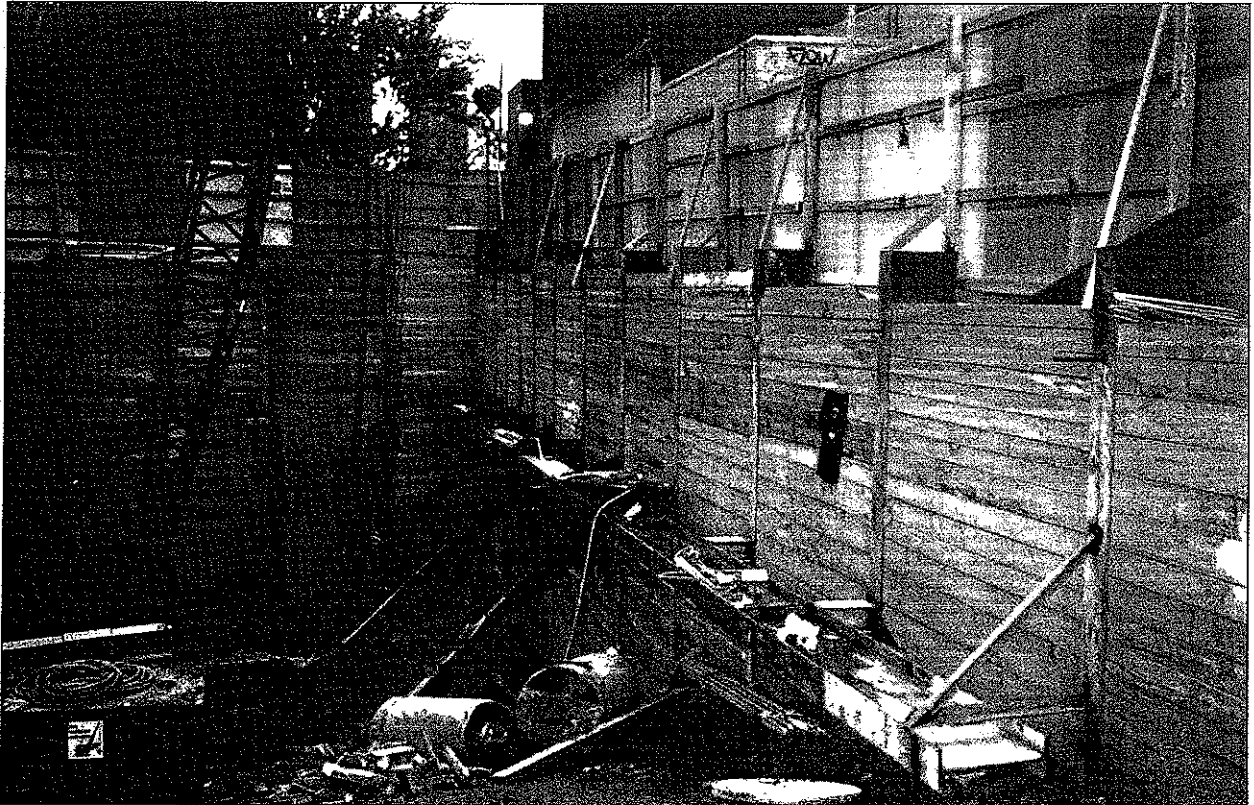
Waler to wall on stubs, Toronto, Ont. (Courtesy of Isherwood Associates, Oakville, Ont.)
